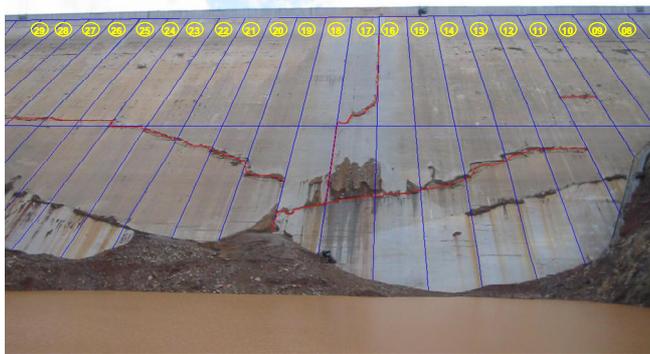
Photo of cracking pattern at a high concrete-faced rockfill dam in Brazil. Source - A. Marulanda.
